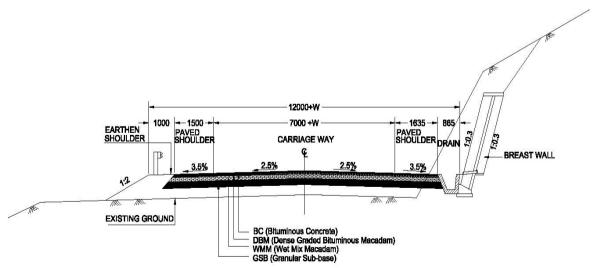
(1): Typical Cross Section for Widening Primarily to Hill Side
